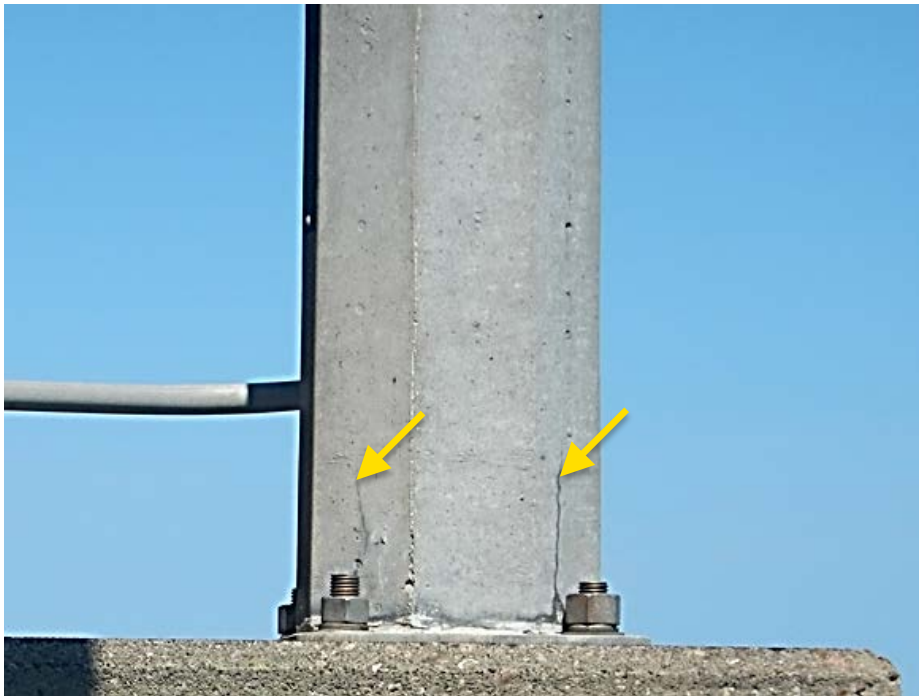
BNB144 Light Pole – Cracking at Baseplate (Looking North)
